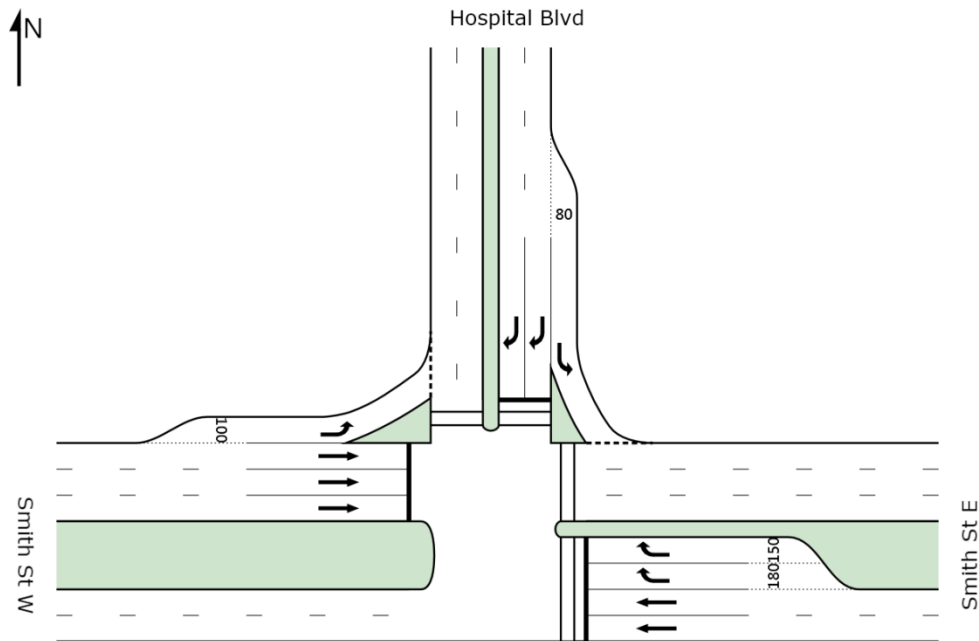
Smith Street / Hospital Boulevard – SIDRA Analysis Layout
